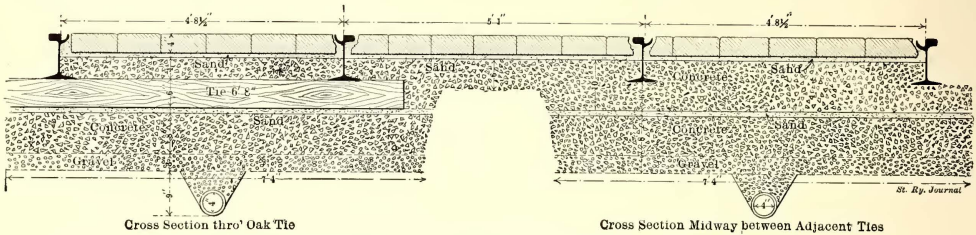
TRACK FOUNDATION FOR MICHIGAN AVENUE, WITH 3 IN. GROOVED RAIL
